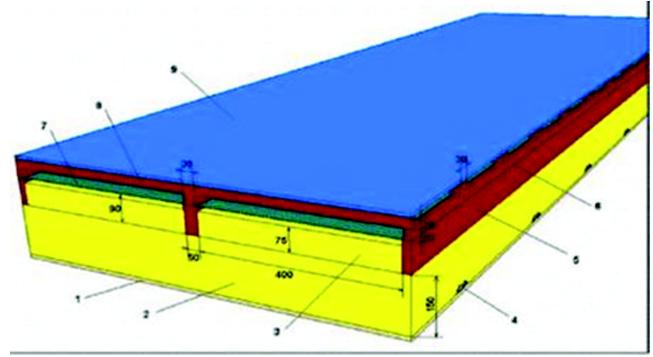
Scheme and main dimensions of the roof insulation system tested in the second series. Legend: 1—gypsum plasterboard; 2—glass wool (first layer); 3—glass wool (second layer); 4—steel profile; 5—wooden rafter; 6—wooden counter-batten; 7—wind barrier; 8—wooden batten; 9—ceramic tiles.
